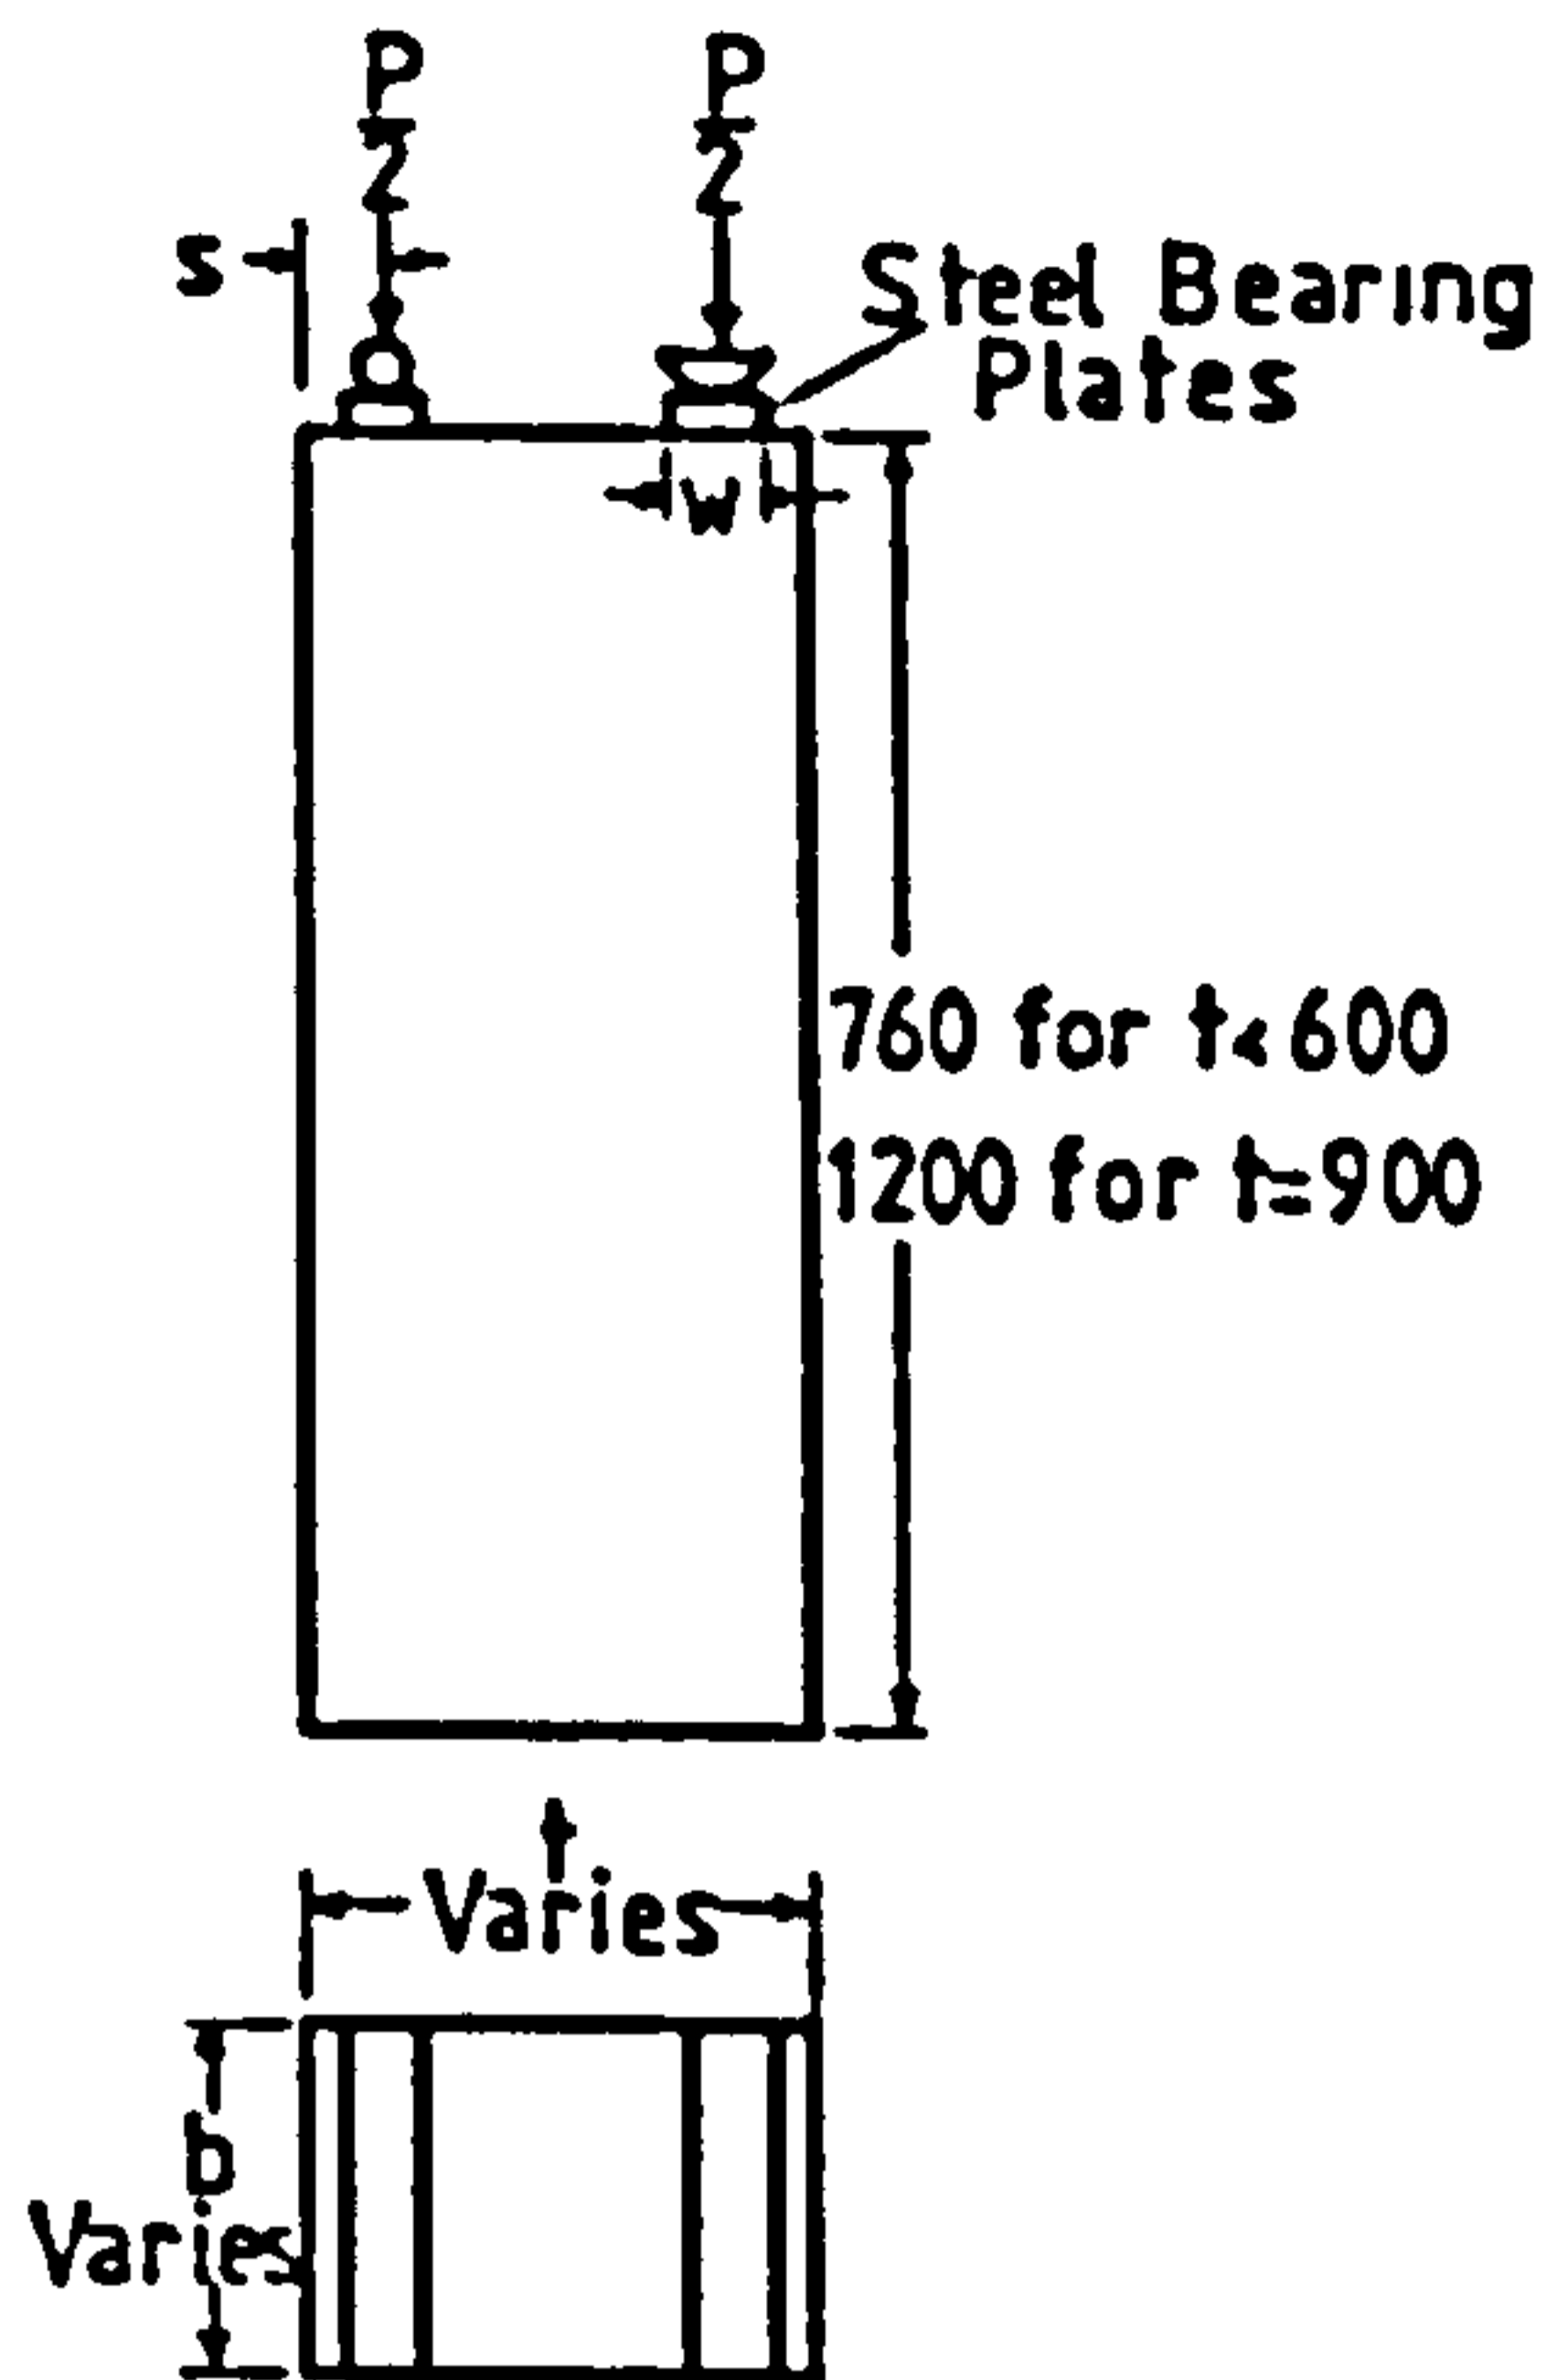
Plain concrete column heads (Kriz and Raths, 1963)
